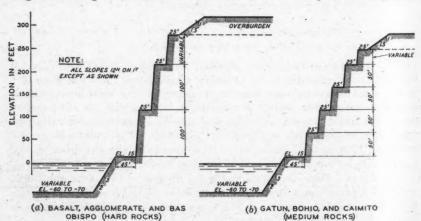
Excavation Slopes for Medium and Hard Rocks
